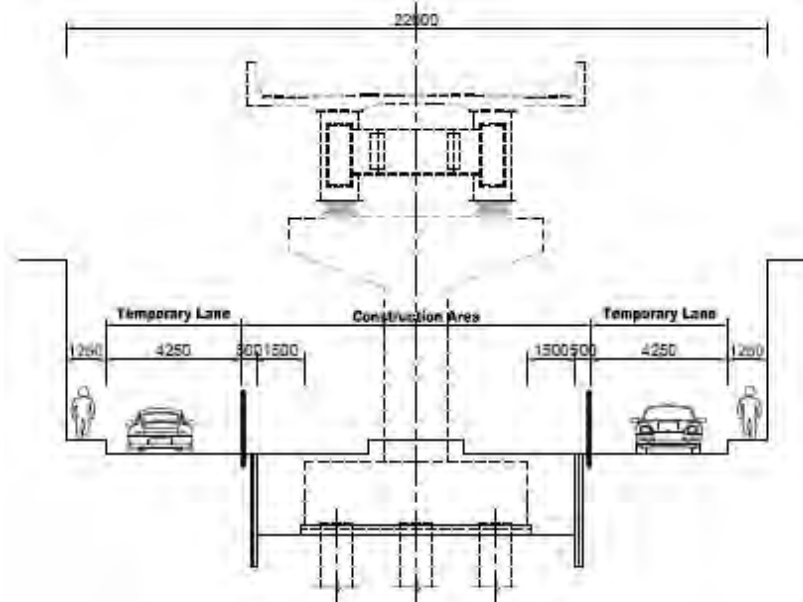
Lane Arrangement for Sub-structure Construction in Tribhuvan Highway
